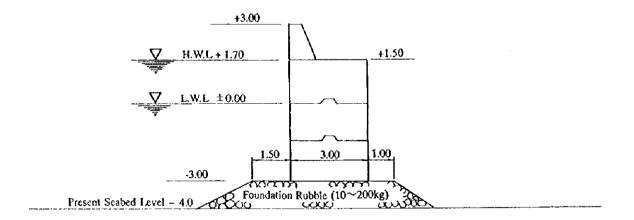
Typical Cross Section of Inner Breakwater (Concrete Block)
